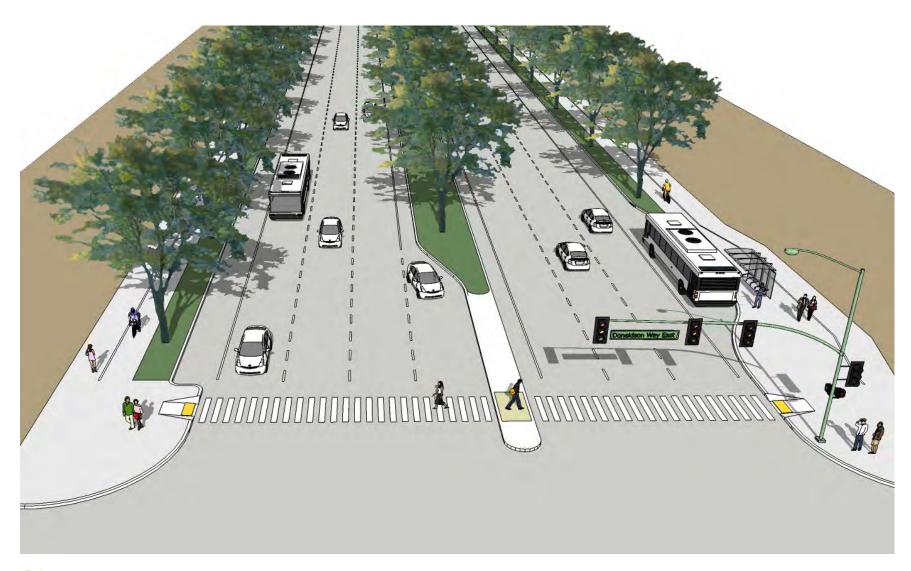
Existing and Proposed Conditions - Section 3 Modified Boulevard Concept
